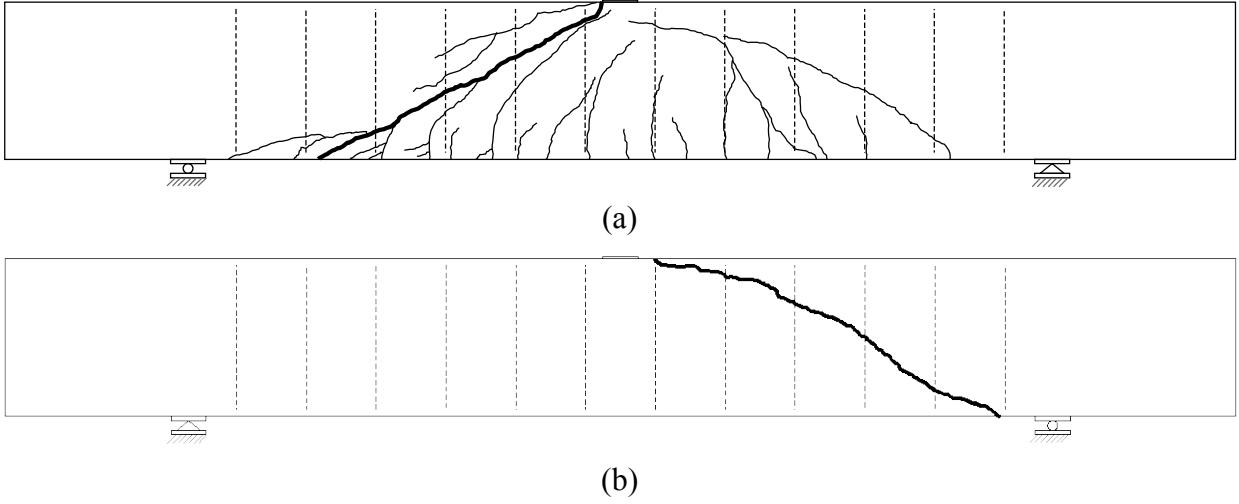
Observed damage in specimen P3S3, (a) front side, (b) back side
